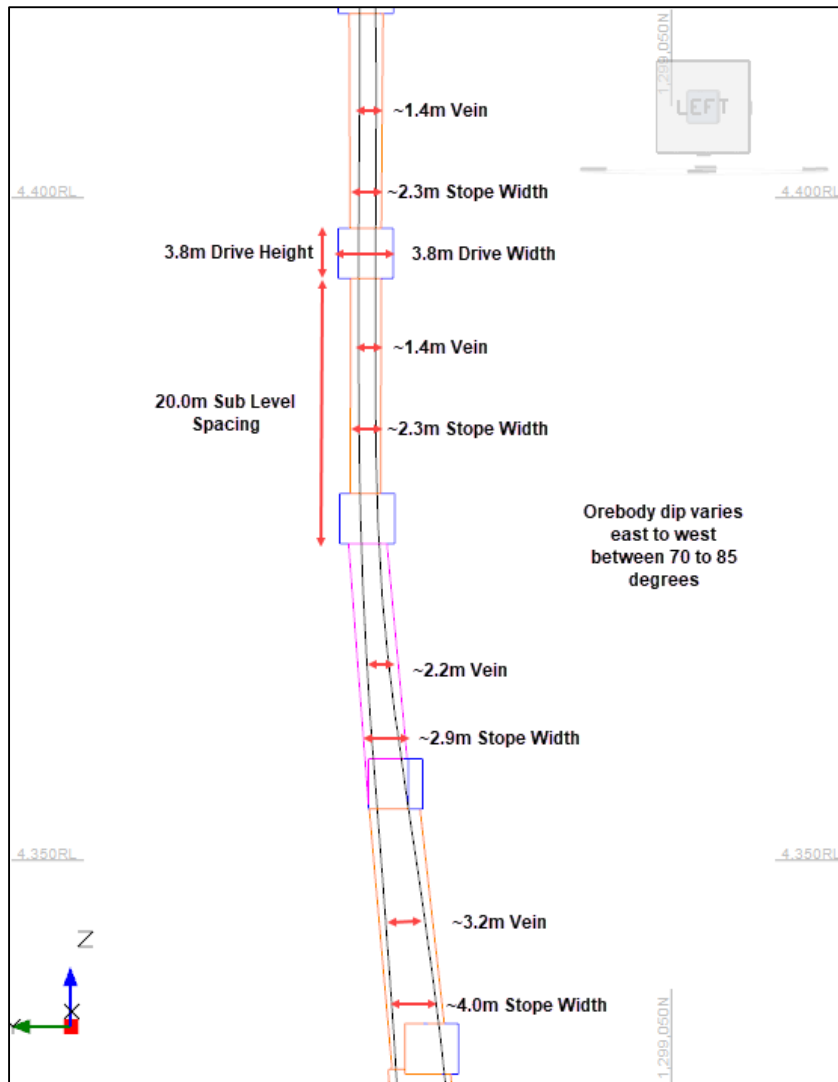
Typical Cross Section 55 Zone – Stopping Layout and Mineralization
